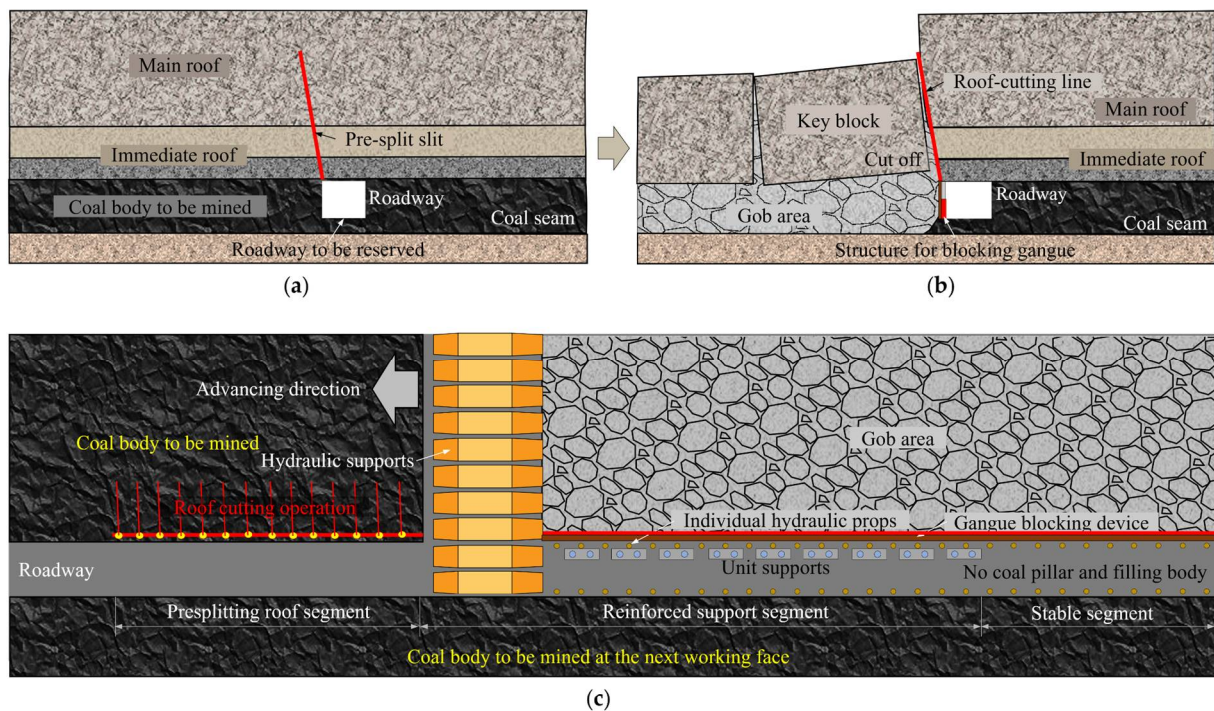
Gob-side entry retaining technology without coal pillar and filling body. (a) Pre-splitting roof in advance of the working face (b) Cutting roof to form roadway automatically (c) Working methods of roof cutting in advance and gob-side entry retaining with no-pillar.
